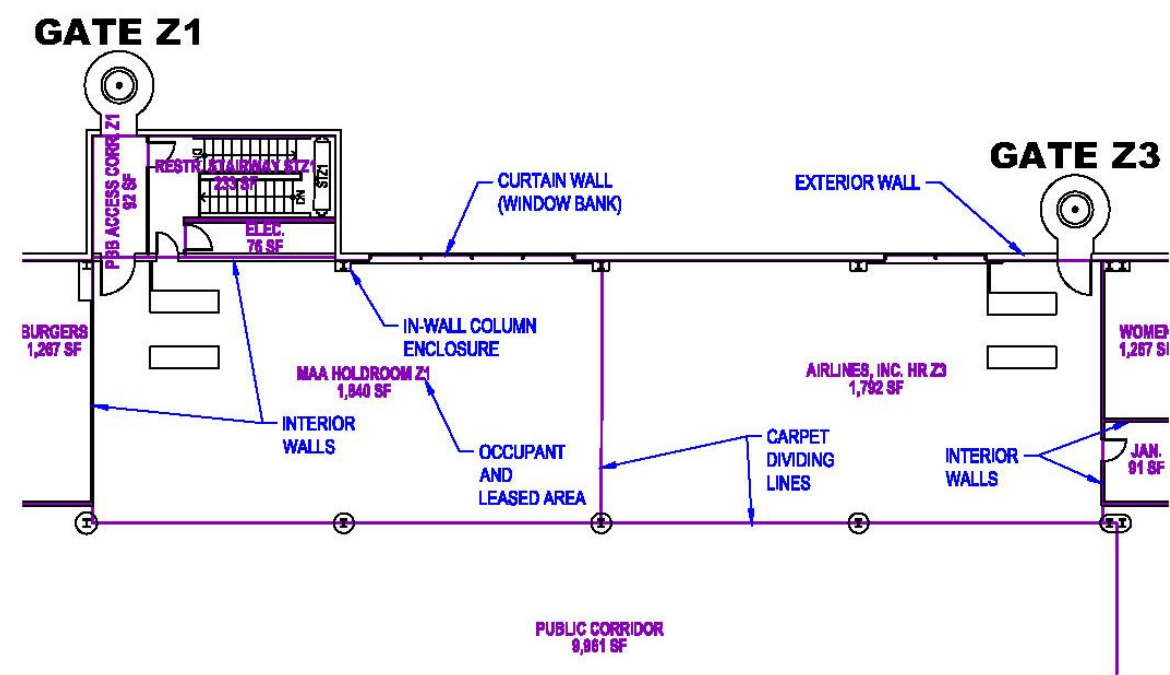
Typical Wall and Window Conditions (Section view)
